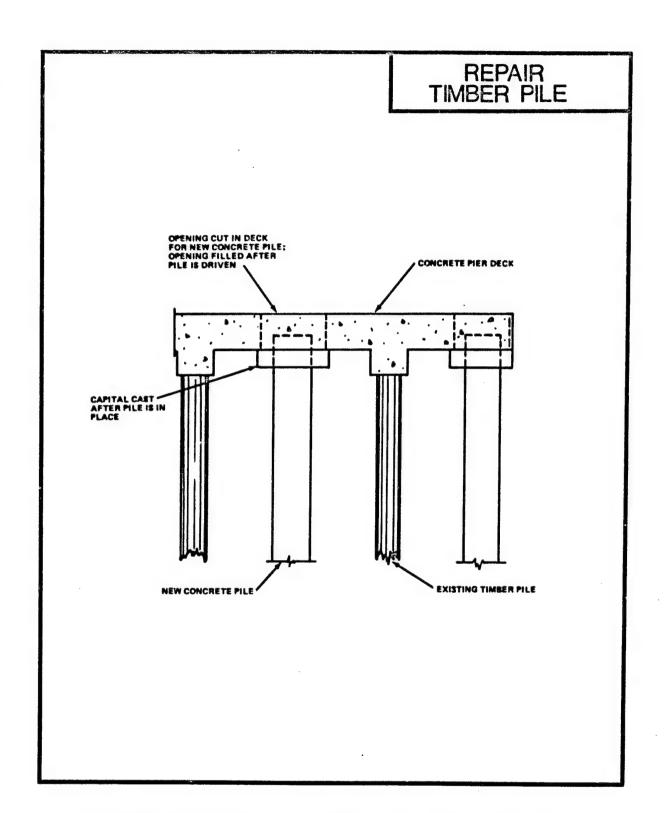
Replacing a Damaged Timber Pile with a New Concrete Pile under a Concrete Deck.
